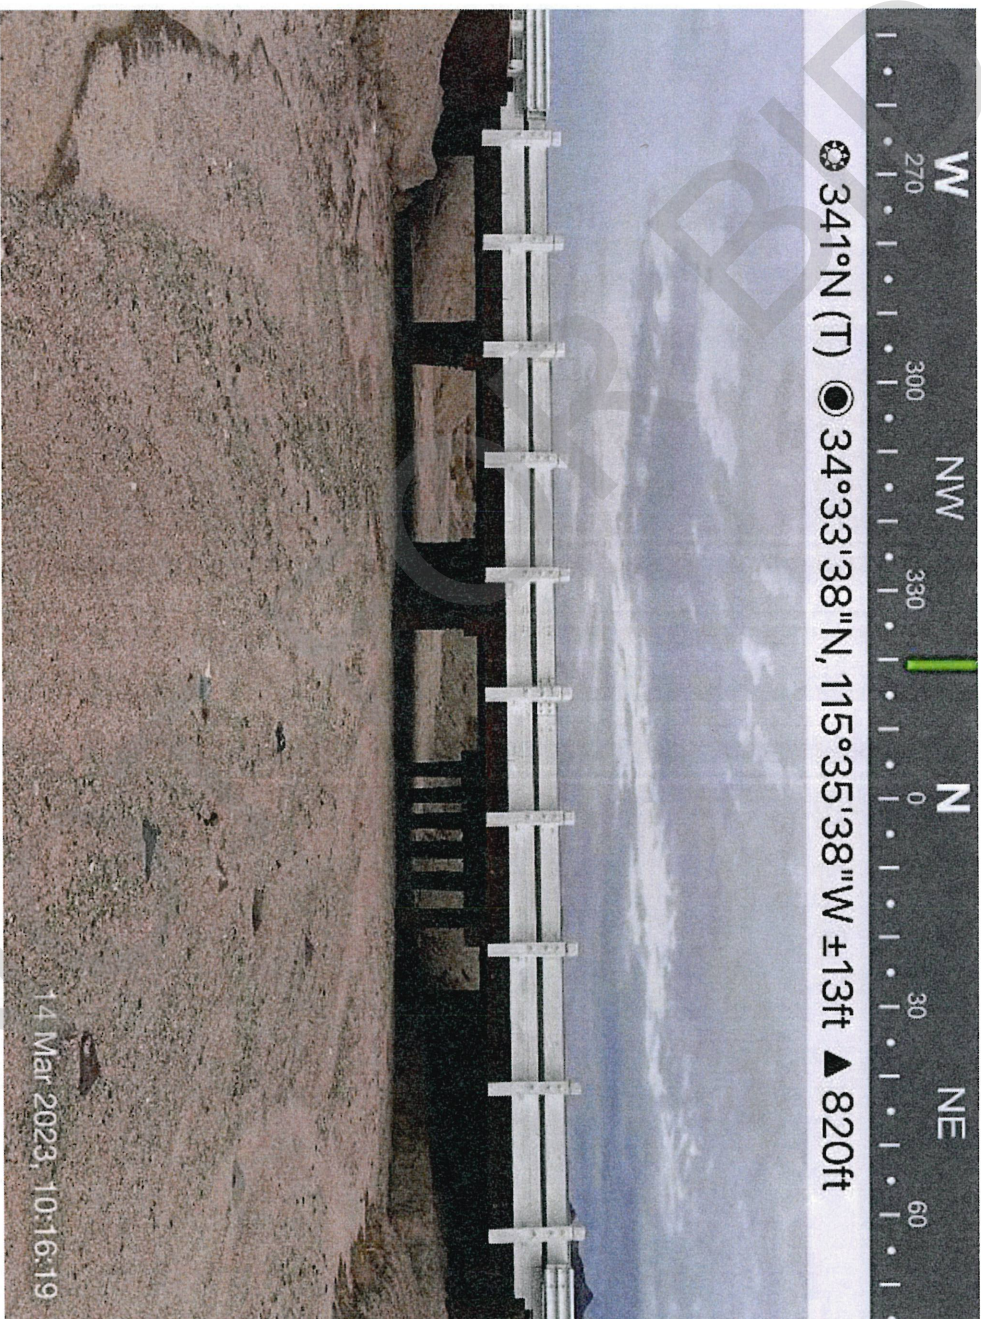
Upstream View of Lanzit Ditch Bridge, Facing North
